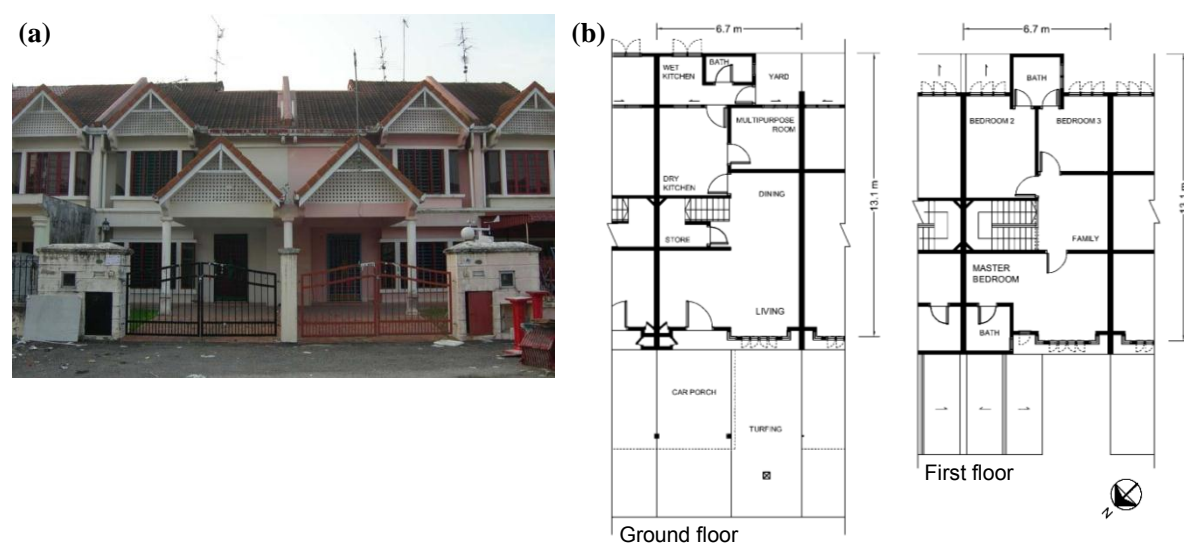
(a) Exterior view and (b) floor plans of the case study terraced house.
